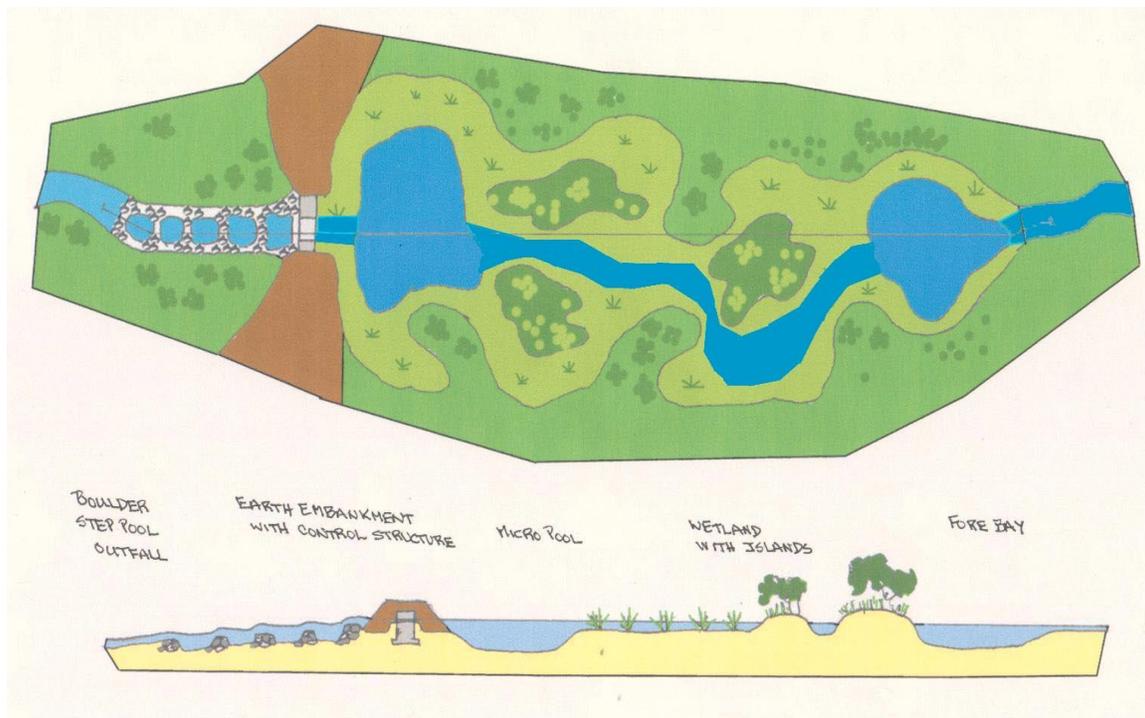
Typical Stormwater Wetland in plan view (upper) and profile (lower)
